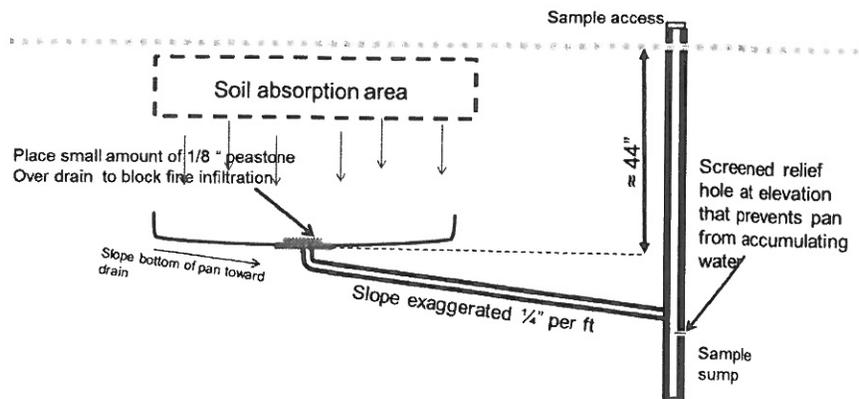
Schemata of a pan lysimeter placed beneath the sand-silt-sawdust layer of the full-scale system at the Massachusetts Alternative Septic System Test Center.
